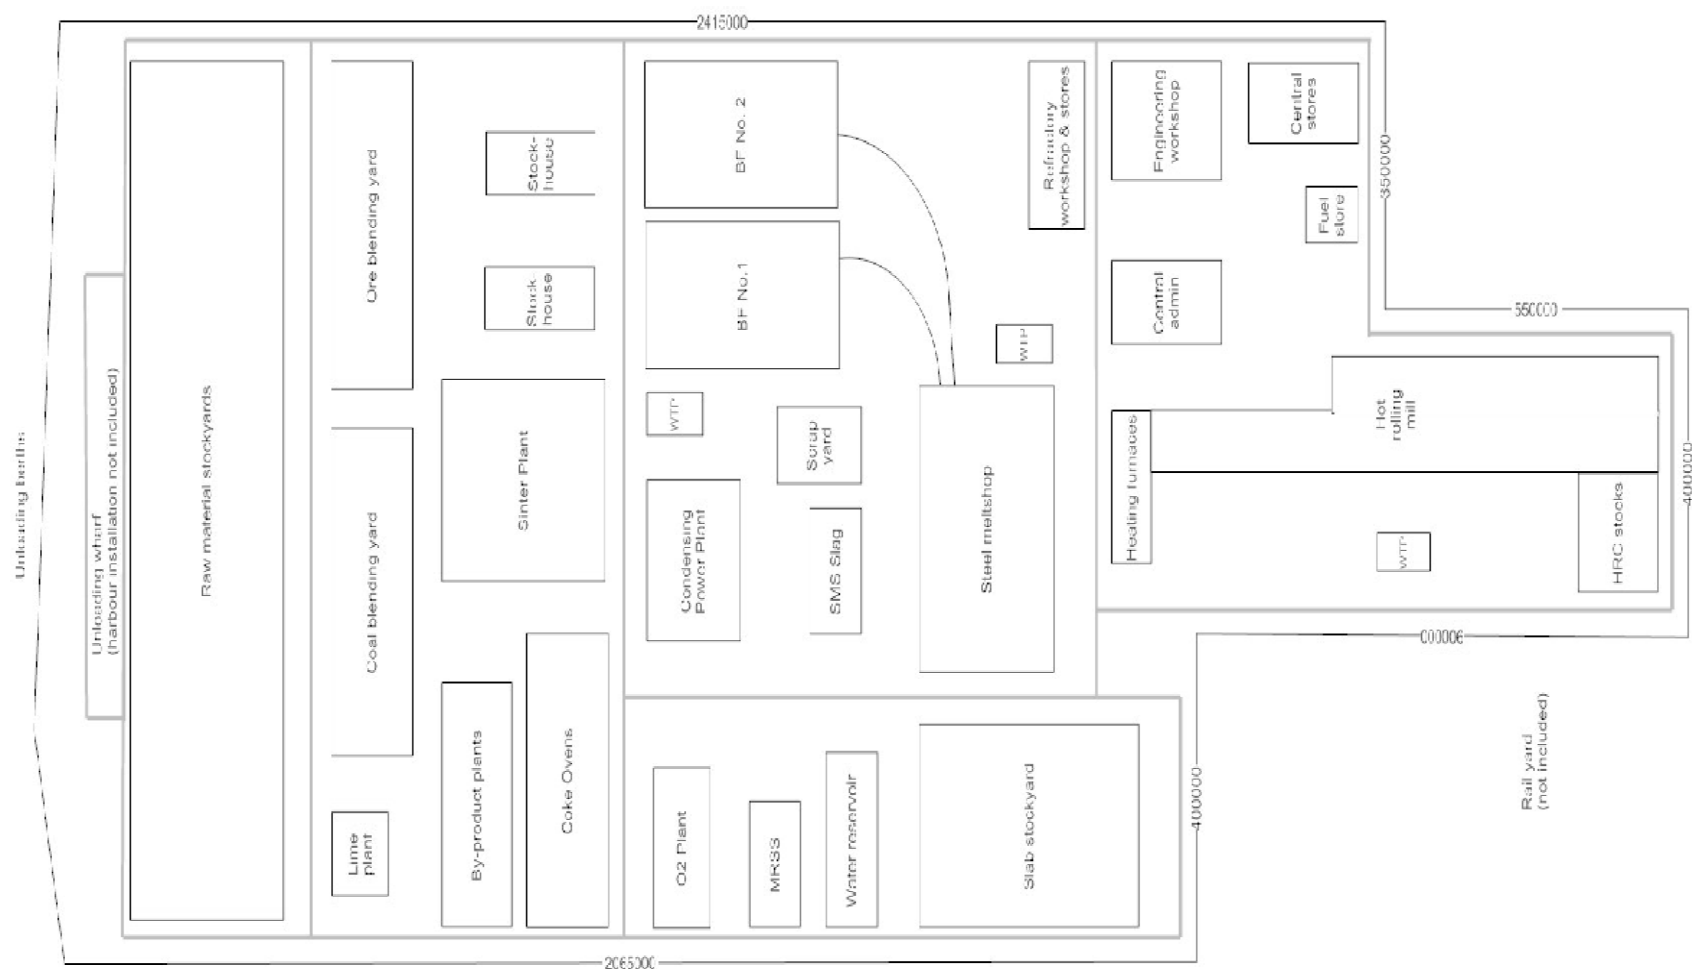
(a): Overview – Plant Layout of the REFERENCE Steel Mill
